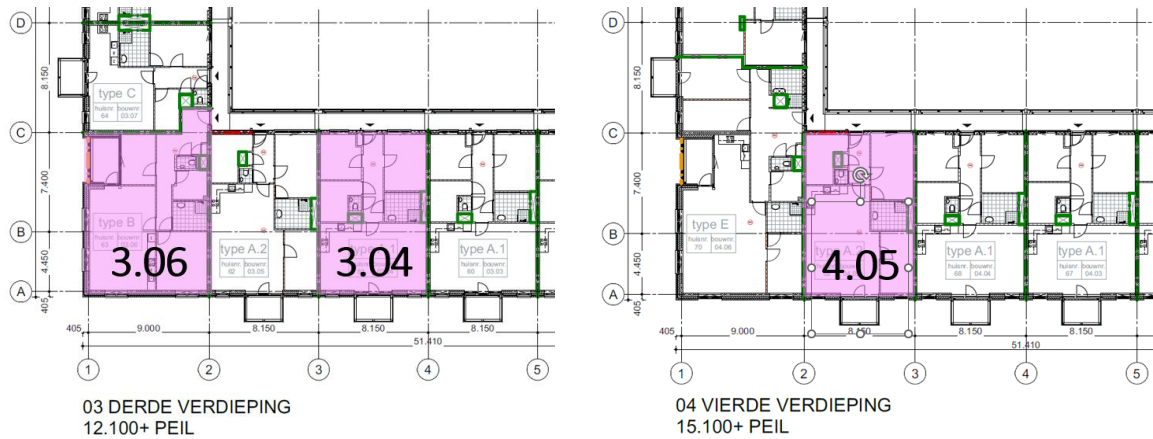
Floor plans with apartments 3.04, 3.06 and 4.05 highlighted
